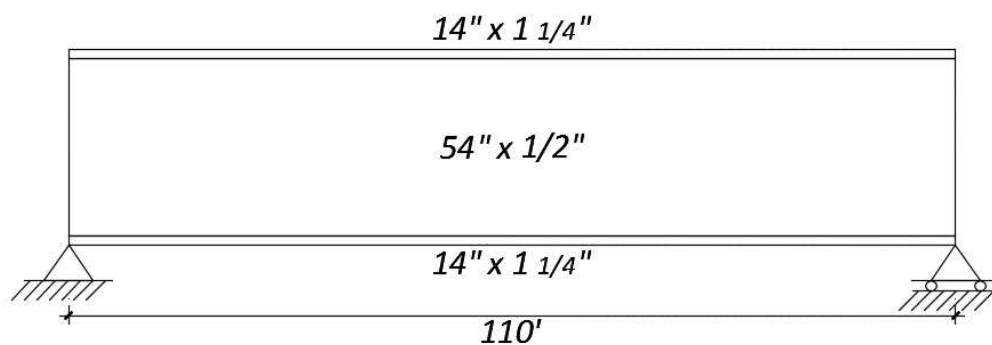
Sketch of the typical 110' one-span composite steel I-girder bridge
